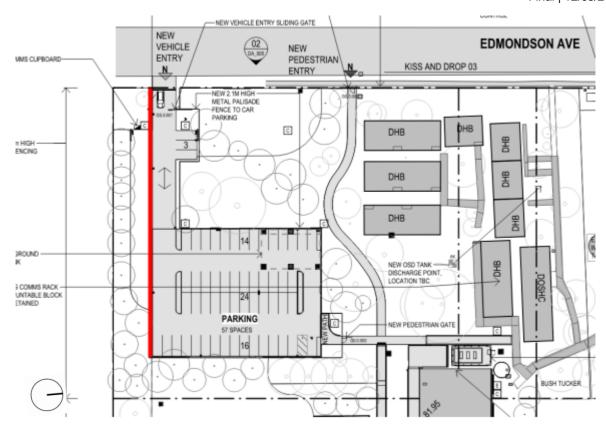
Acoustic barrier shown on architectural drawings, in red (Source: Pedavoli Architects)
